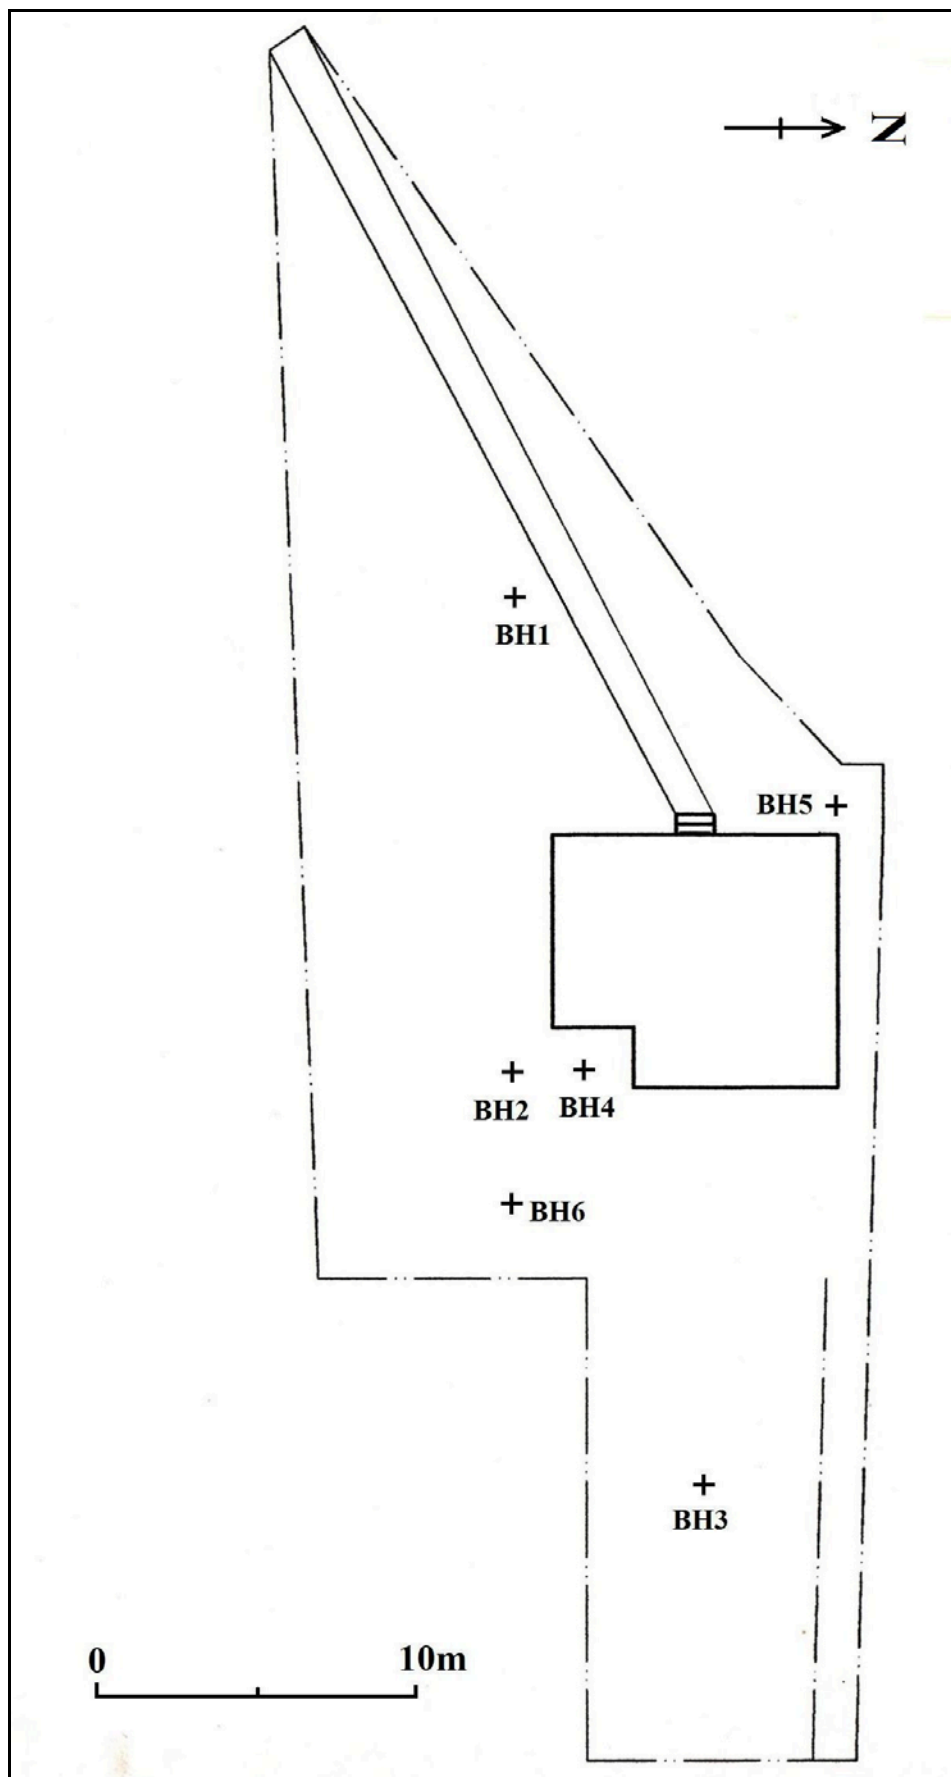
Seymour House, Rye: Site plan showing location of boreholes
